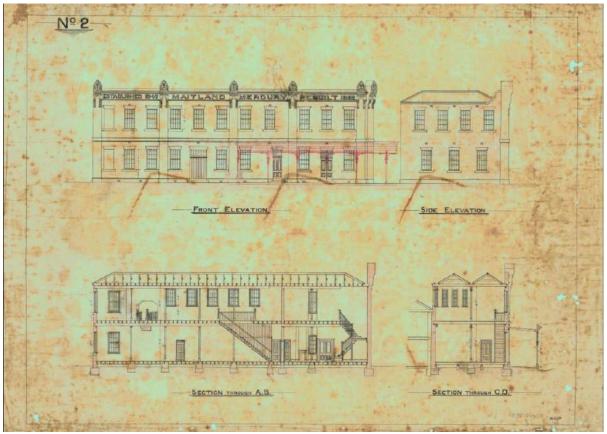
Plan of Alterations and Additions to the Maitland Mercury Office West Maitland, NSW, 31 December 1881
